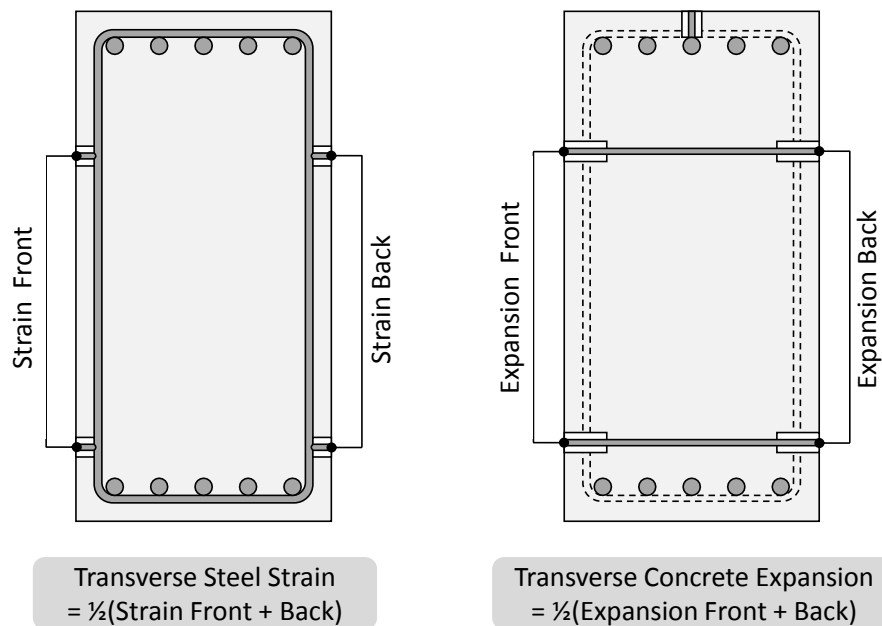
Calculation of Average Reinforcement Strains and Concrete Expansion
